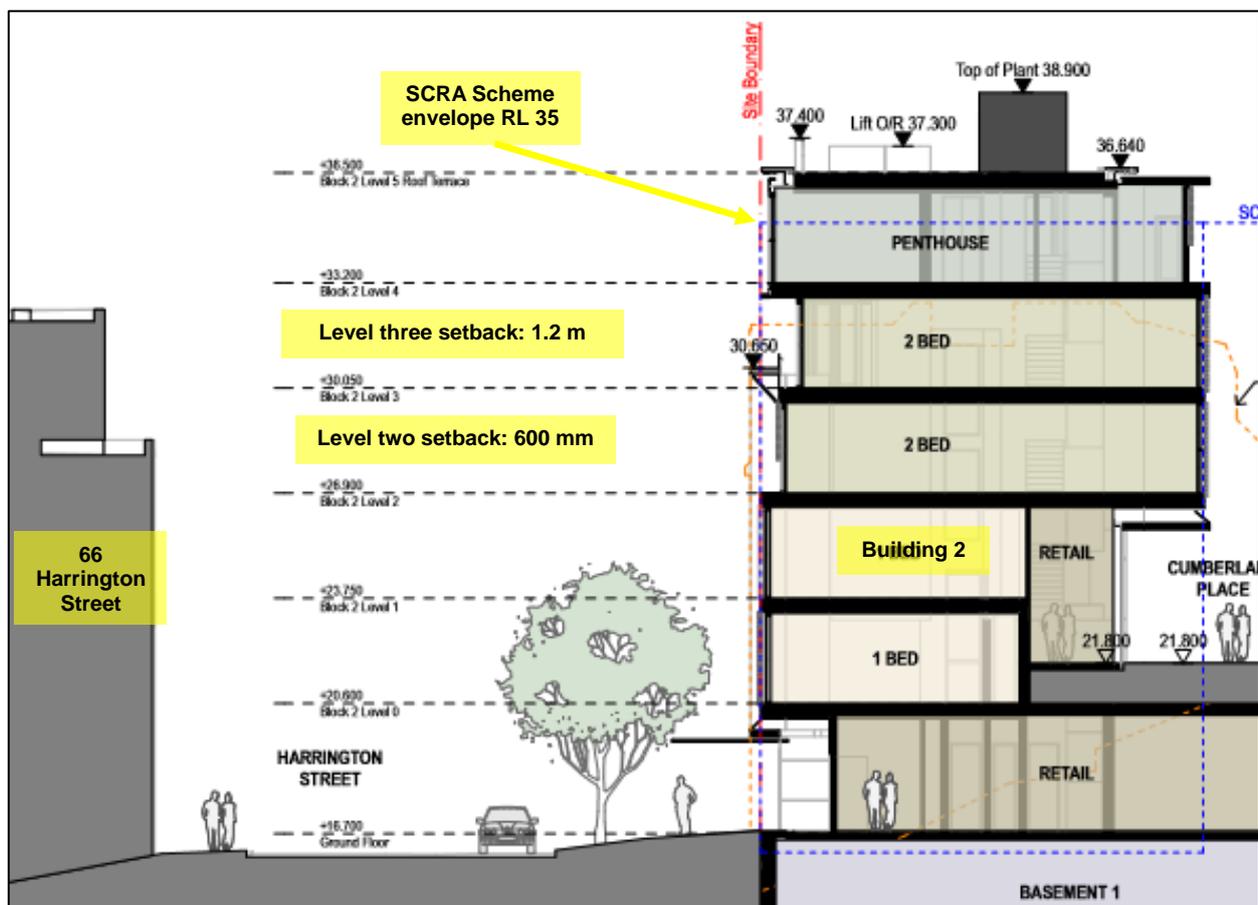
Cross-section of Building 2 to 66 Harrington Street (Source: Architectural Plans)
